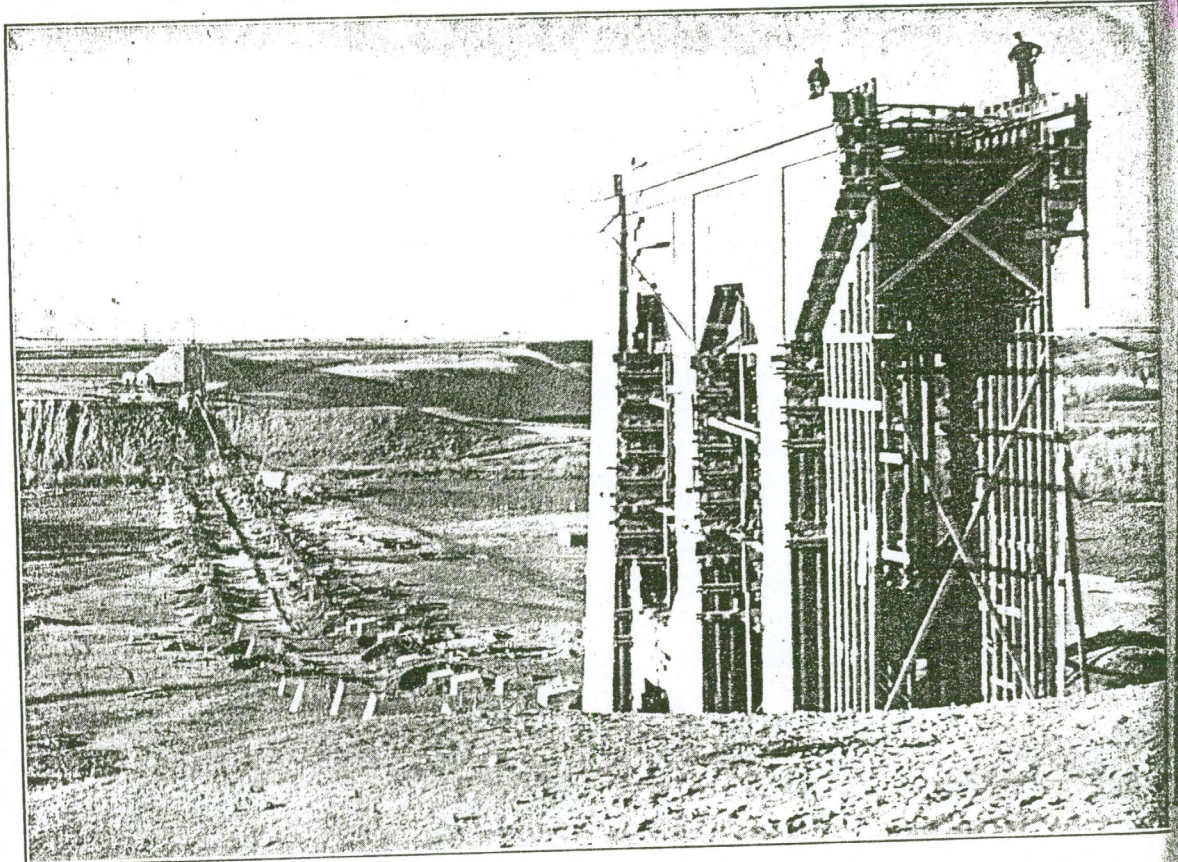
Looking Northwest from East Abutment of Judith River Viaduct.
